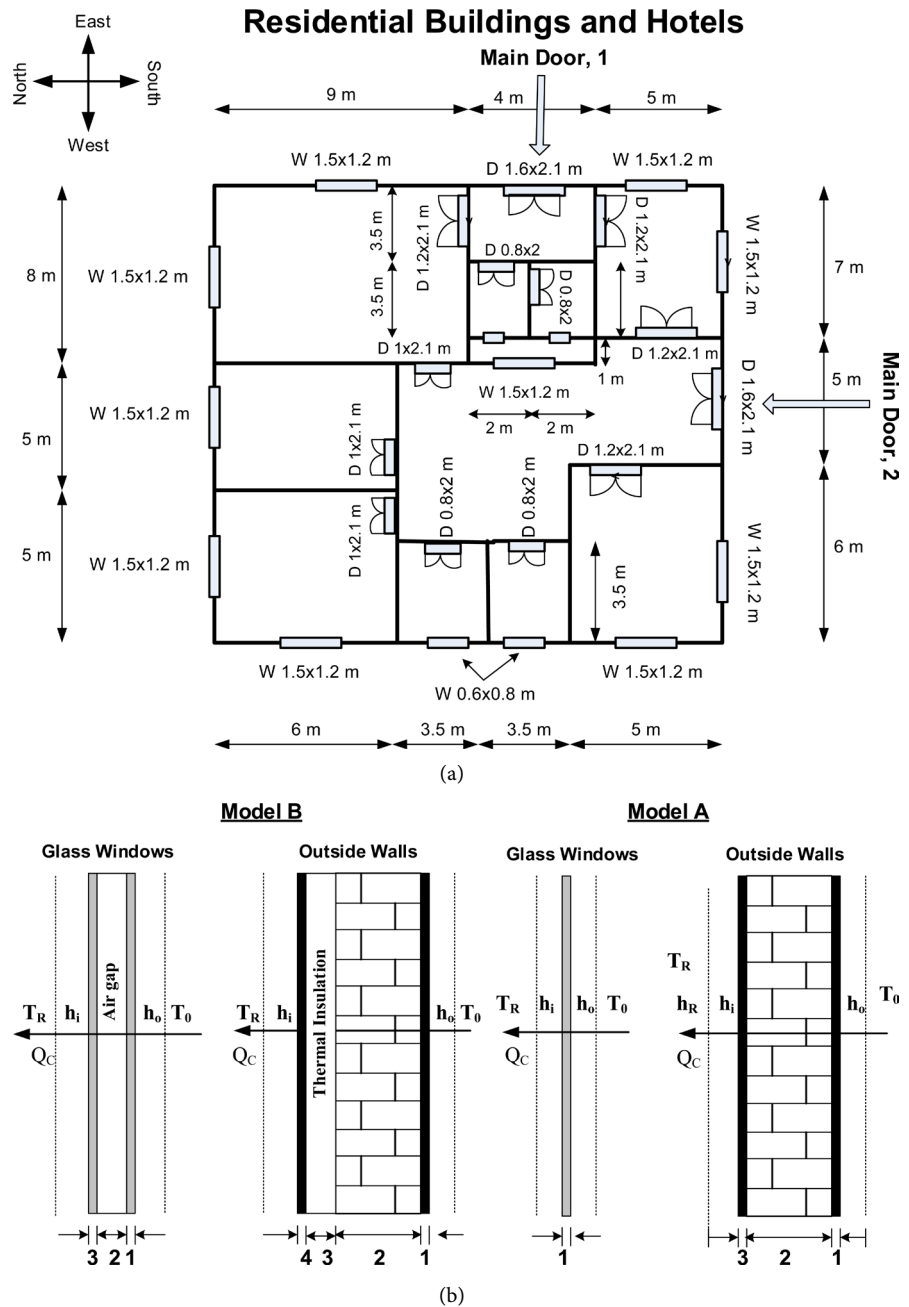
(a) Residential building layout; (b) Composite wall and glass window model A and B.
